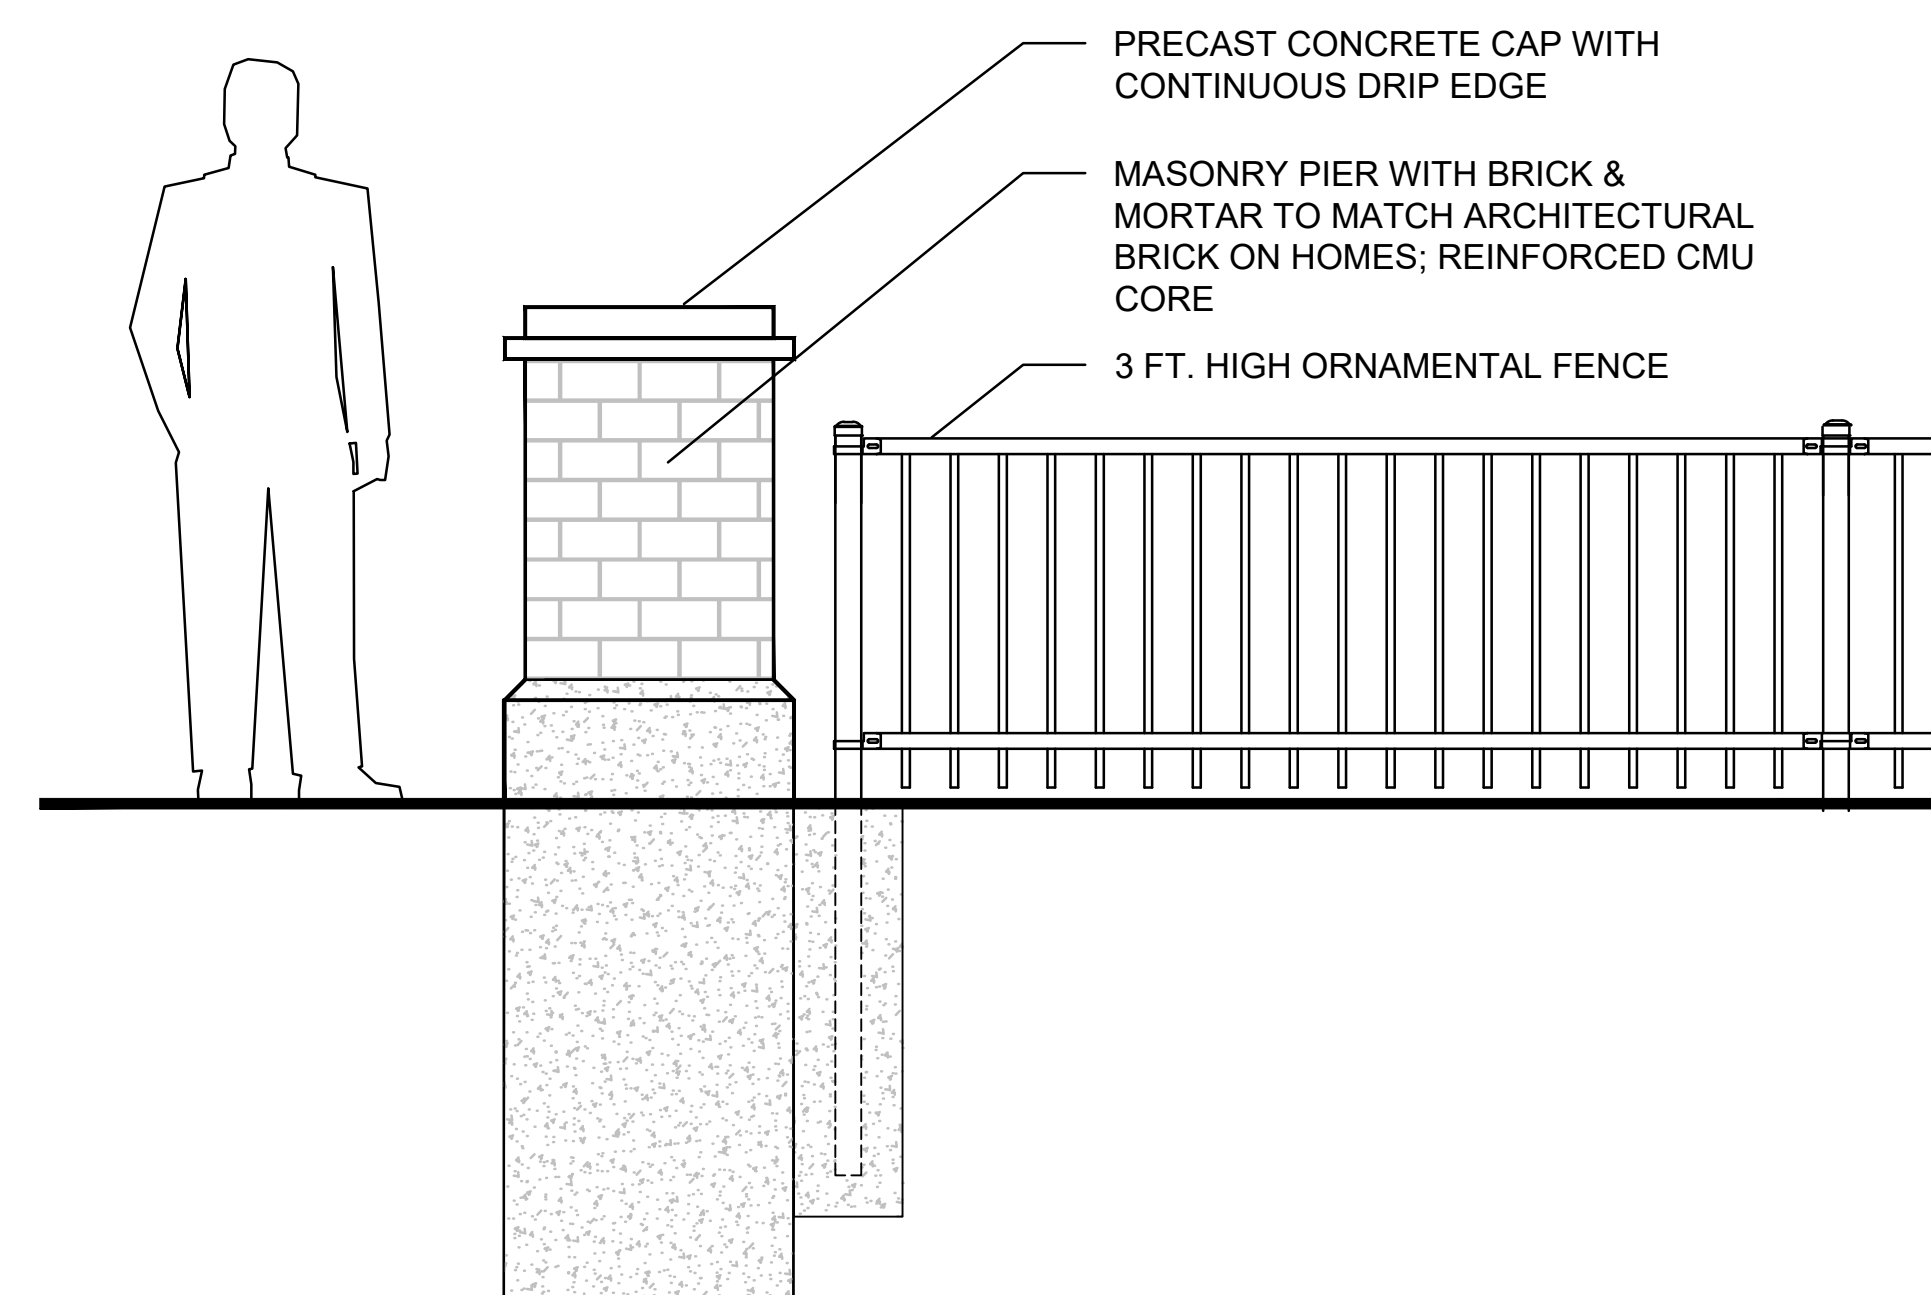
DETAIL: LANDSCAPE PLAN FOR PROTOTYPICAL FOUNDATIONS
